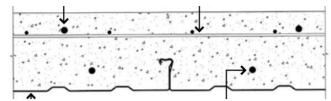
Flat soffit metal deck concrete slab to simplify fire wall connection and fire sealants
